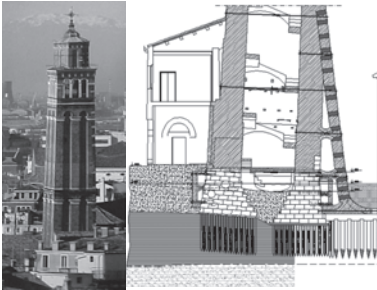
Picture of the Santo Stefano Bell Tower and schematic section of the tower foundation with buttresses built in 1903.
